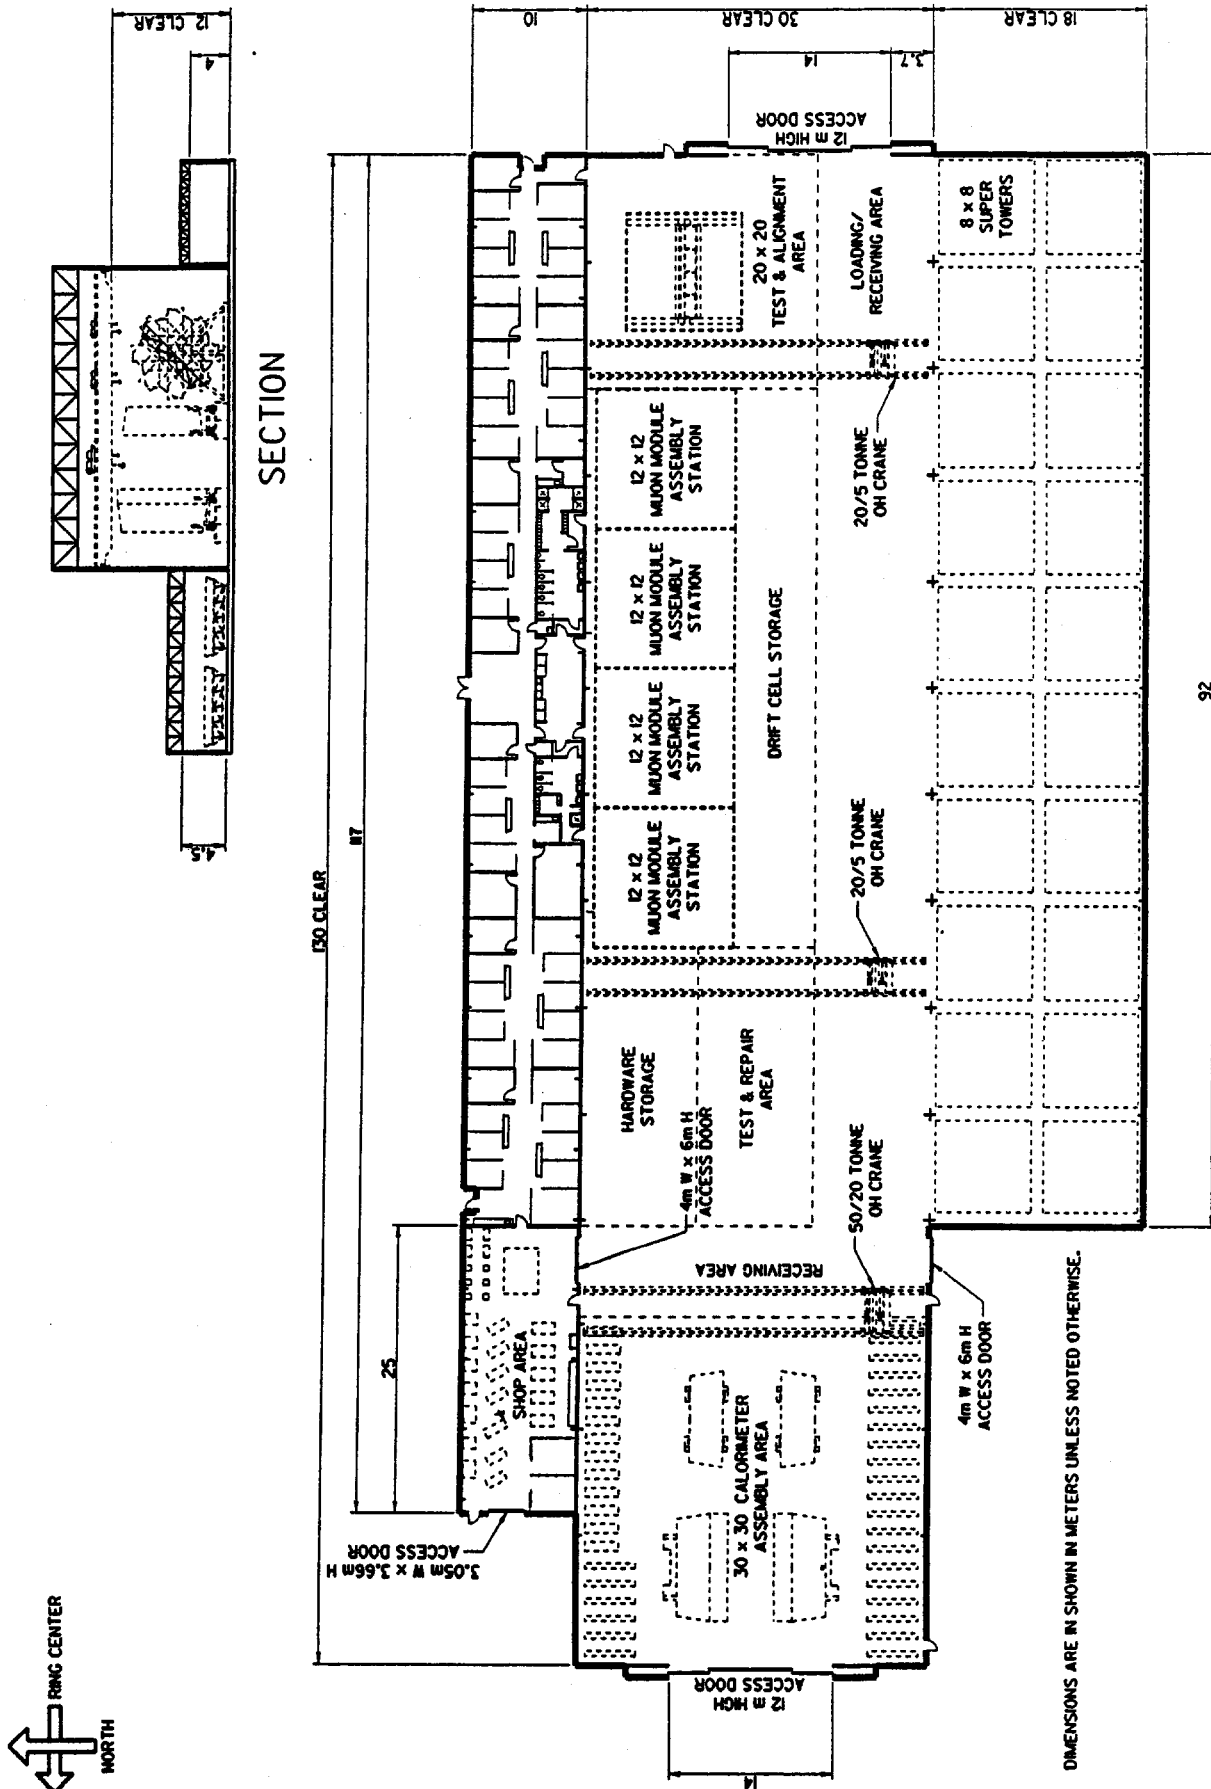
Layout of the IR8 assembly building during muon chamber and calorimeter assembly.
